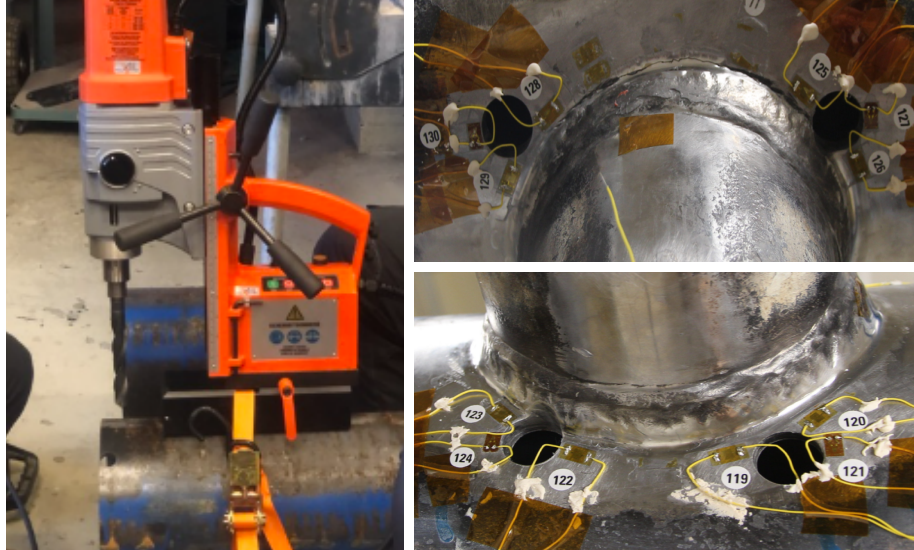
Hole drilling by Magnetic-base drill, Crack-deflecting holes and crack-tip holes.
